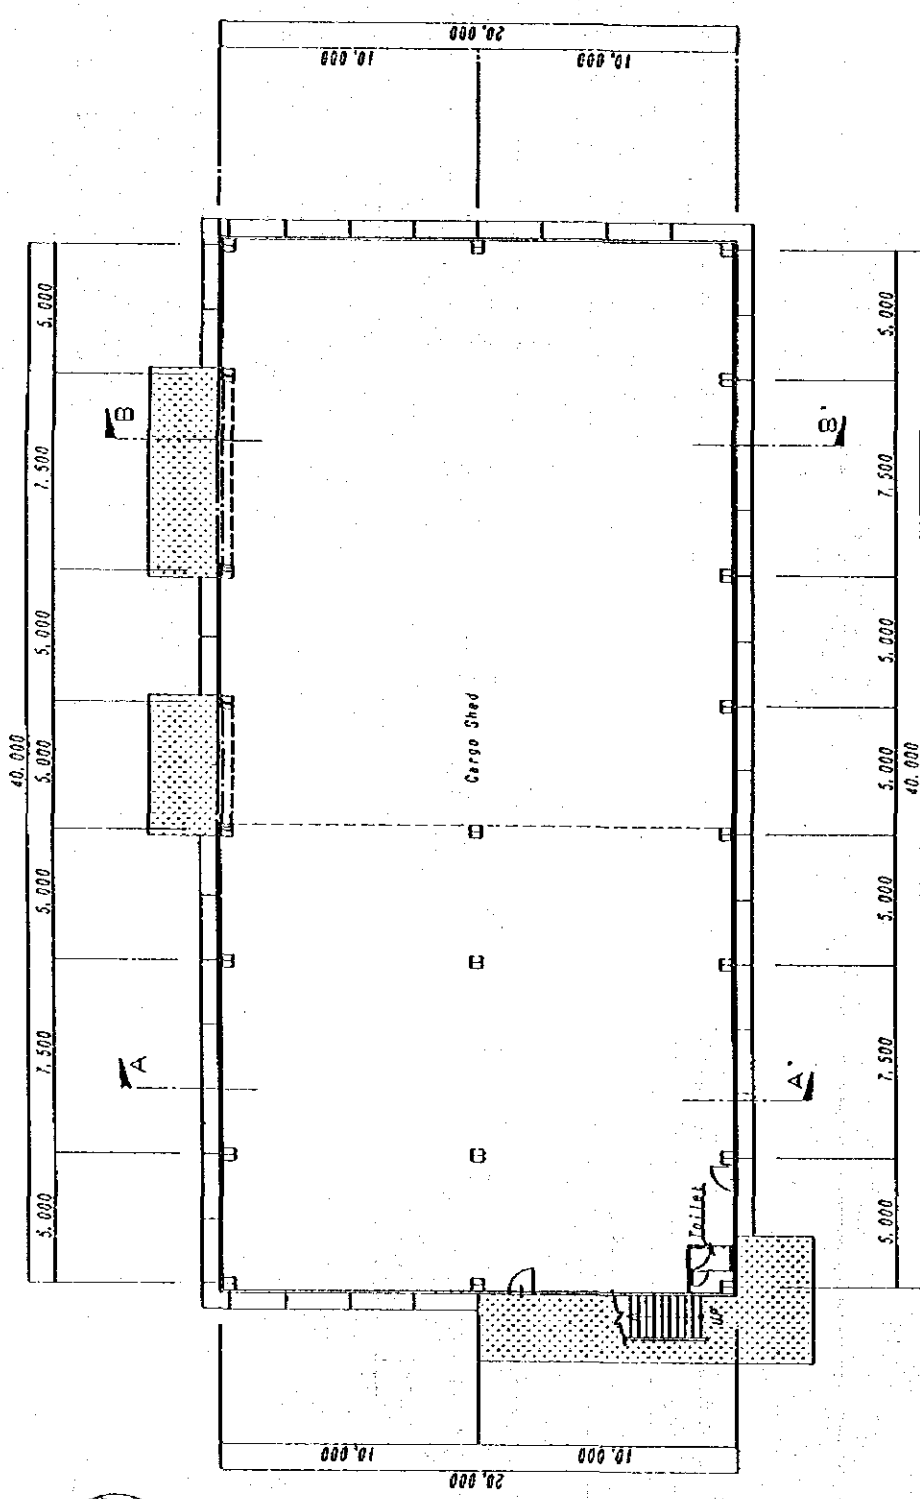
Ground Floor Plan of Cargo Shed and Administration Office
